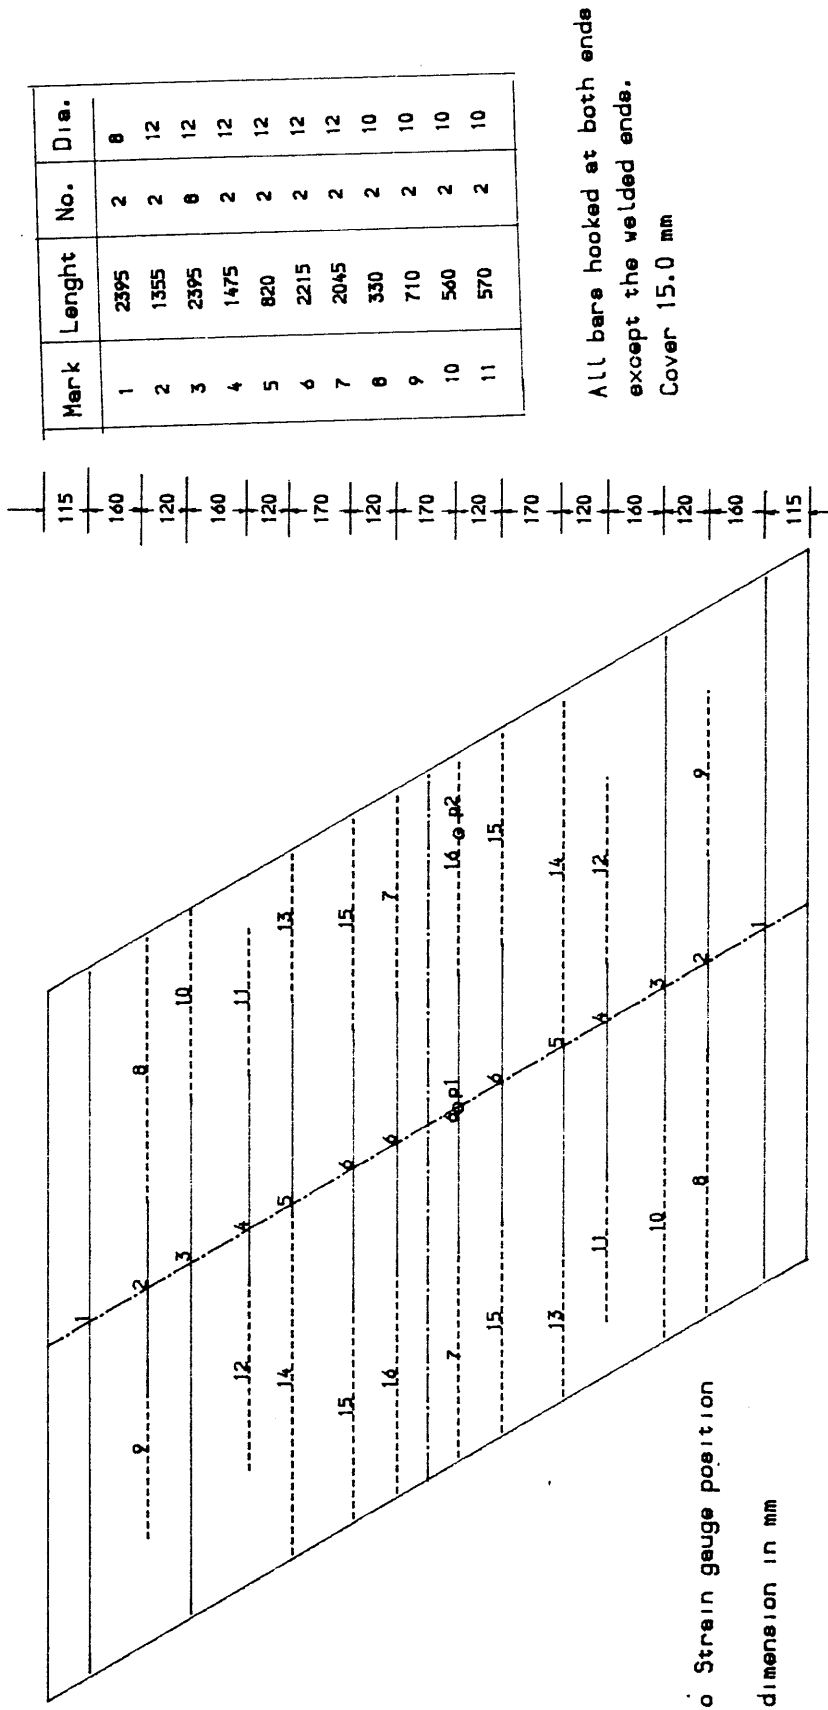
MODEL SKEW SLAB NO. (1) Details of bottom transverse steel parallel to the supported edge and position of strain gauges.
